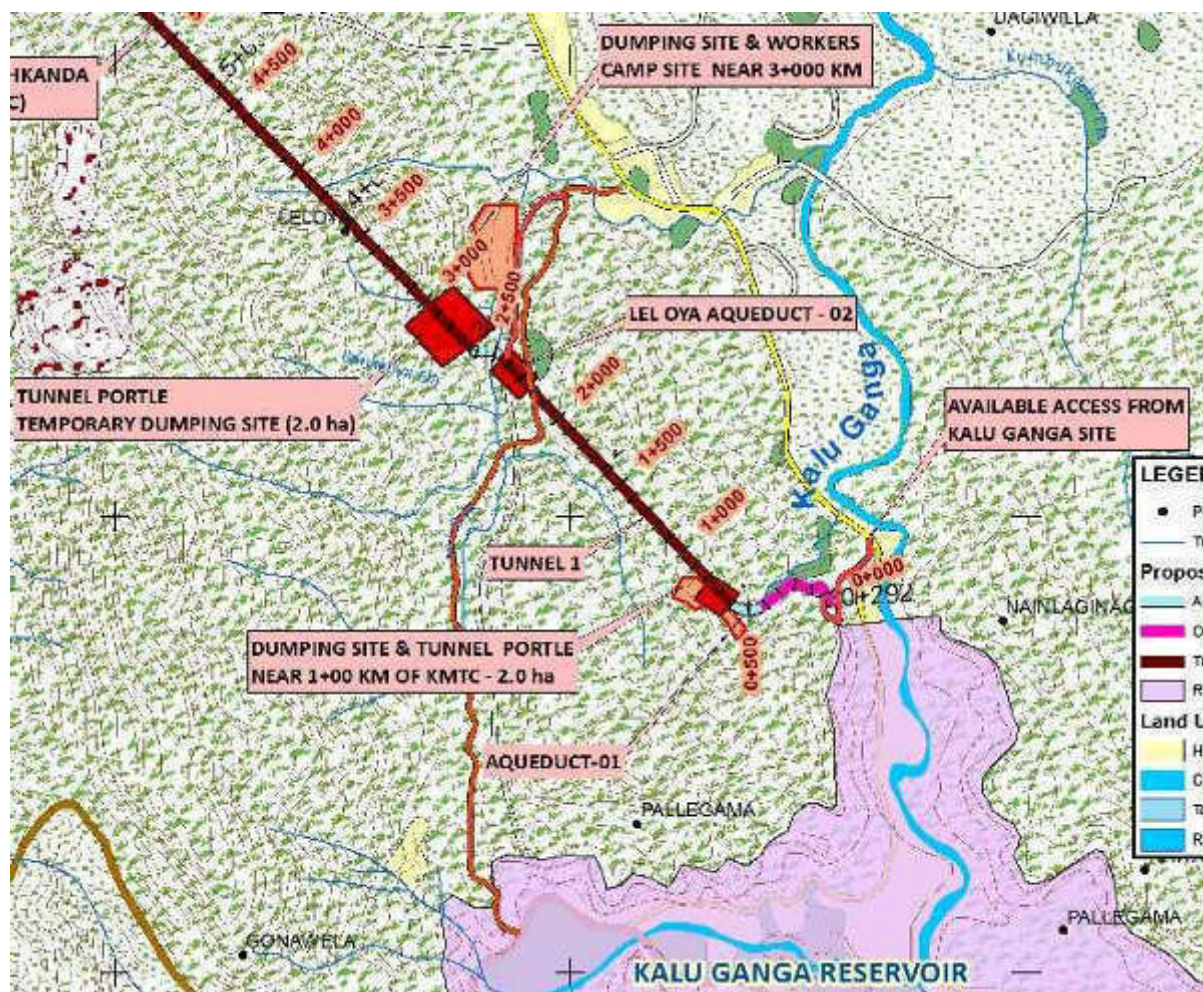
Tunnel 1 Portals and Tunnel 2 Upstream Portal: Access Situation
